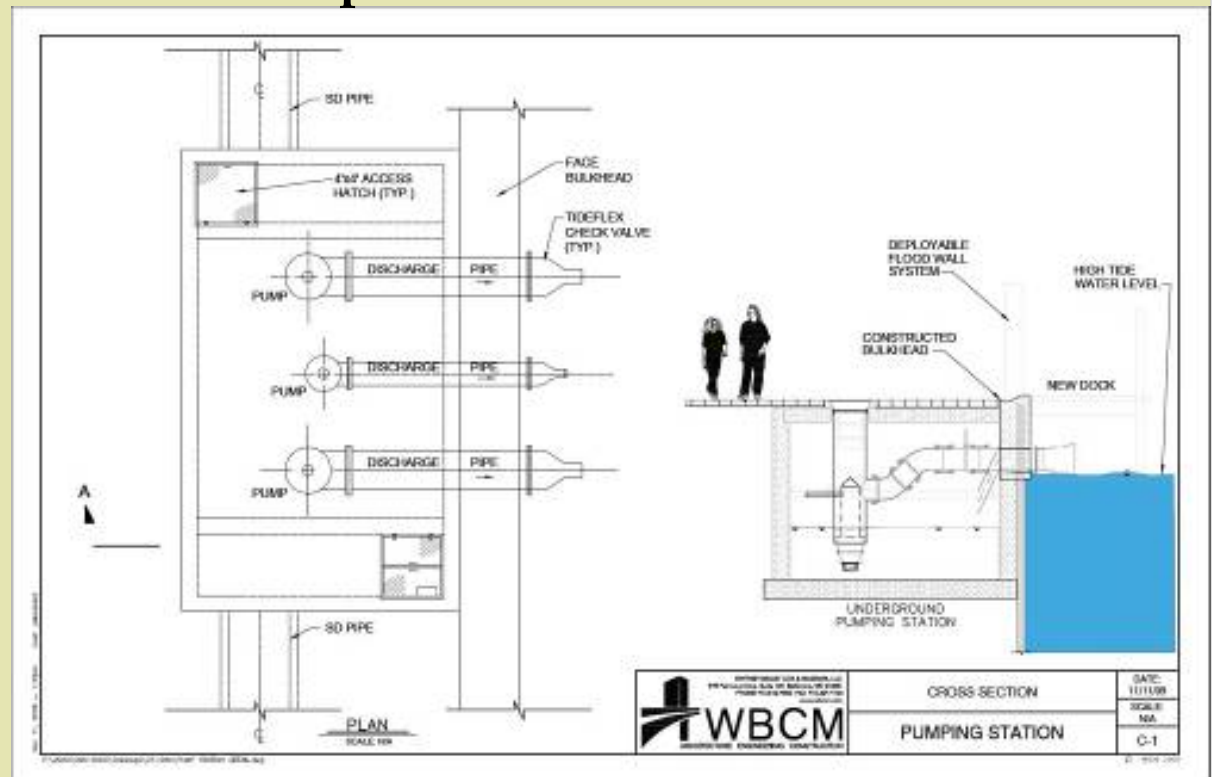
POTENTIAL FLOODING BEHIND FLOOD WALLS
